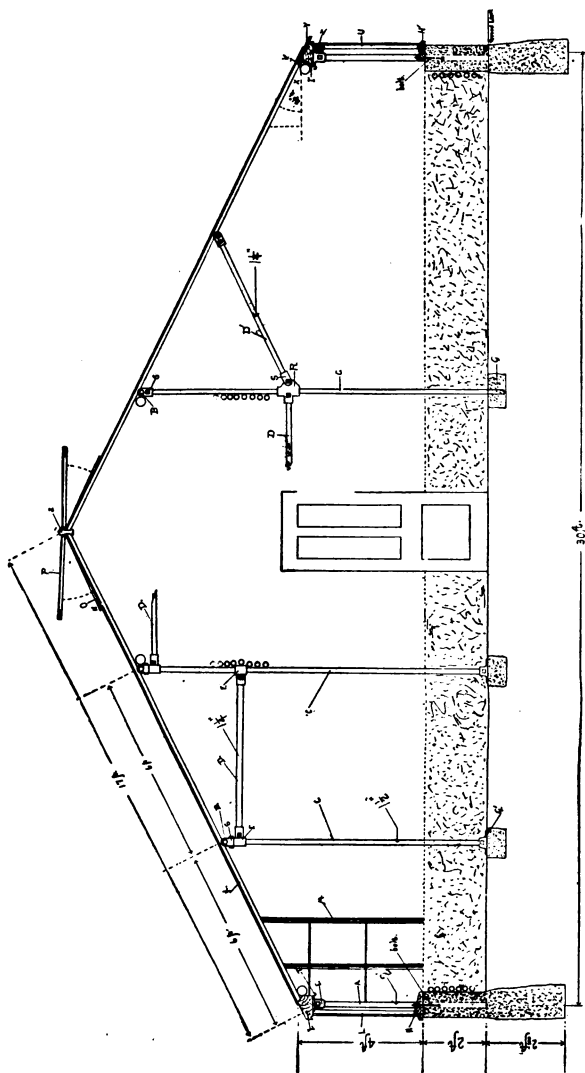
Two methods of framing a semi-iron pipe-frame greenhouse and the principal members used in greenhouse construction. A, side post; B, purlin; C, purlin post; E, F, G, R, and S, malleable iron fittings; H, glazing sill; I, and Y, eave plates; J, ridge; K, sash bar; N, ventilator header; O, ventilator weather strip; P, ventilator; T, drip gutter; U, side ventilating sash; V, sash bar attachment for metal eave plate; Z, sash header
